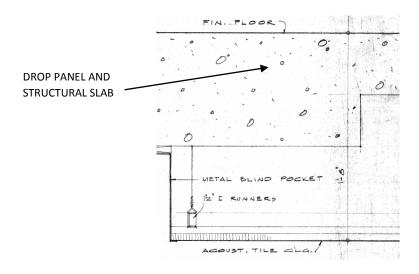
Section through typical floor in existing building. From A.12: Window & Wall Sections
